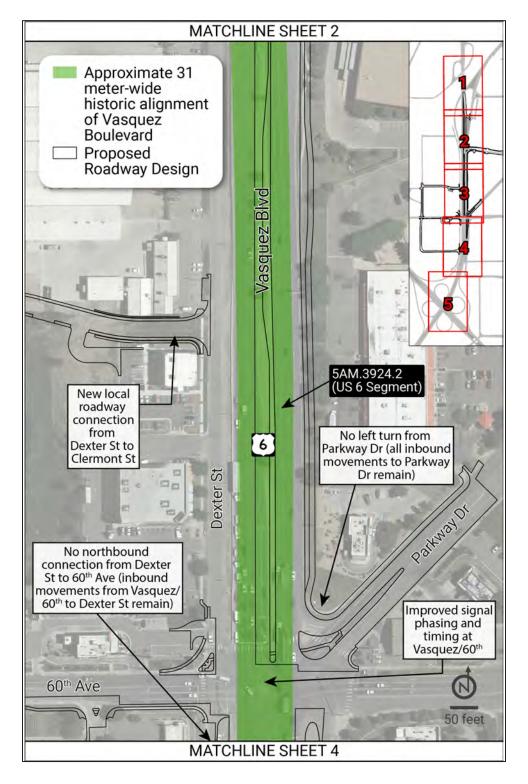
Vasquez Boulevard Proposed and Existing, Sheet 4
